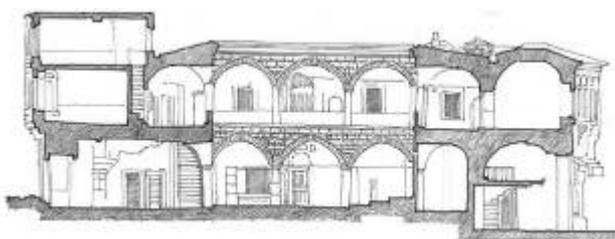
The Section-Elevation of Ali Pasa Han [4]
